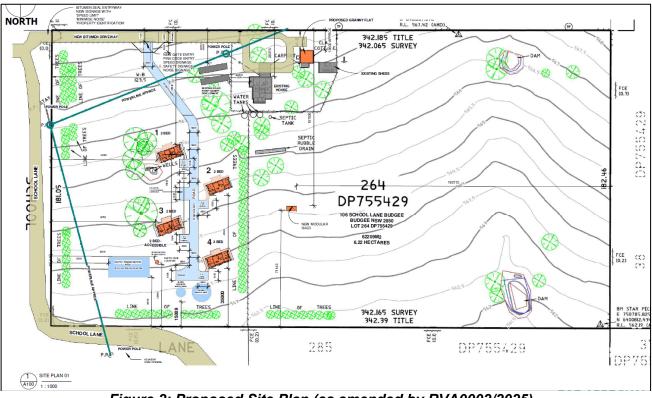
Proposed Site Plan (as amended by RVA0002/2025)
